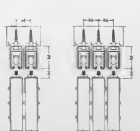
Cross-section showing overhead bracket attachment without weatherstrip of two parallel sliding doors, and of three parallel sliding doors.
